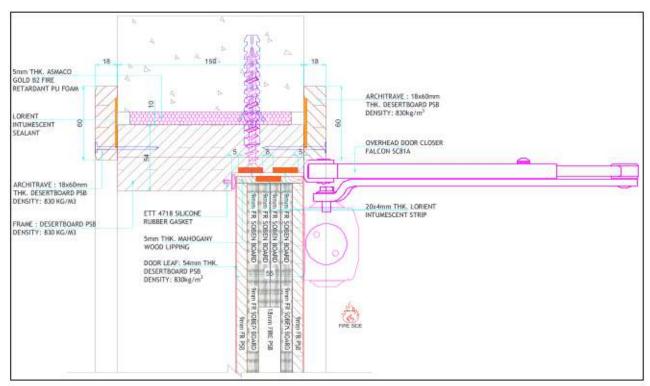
Detail C of drawing 4). (Drawing provided by the test sponsor)
